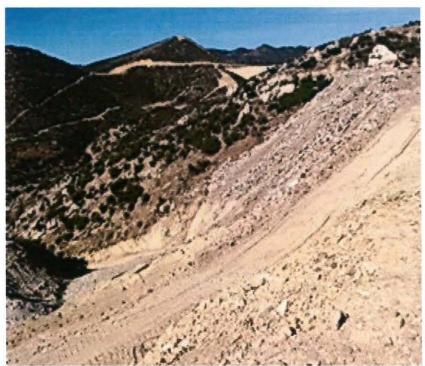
View facing west of the stockpiling areas where fill (construction debris) has been discharged into the tributary, filling the canyon from the top. Also, graded road area heading further south into the canyon.
